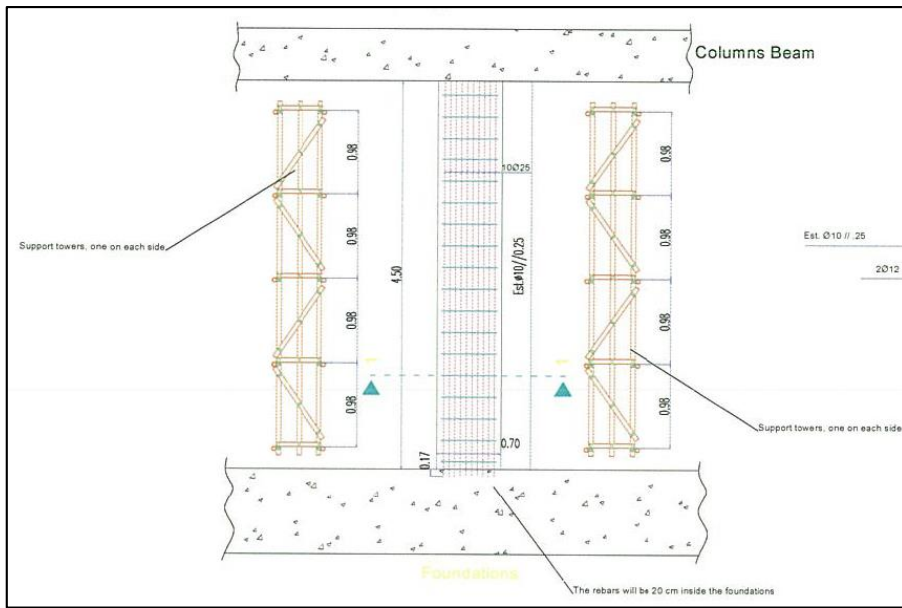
Support towers for temporary supporting upper part of bridge during column repair
